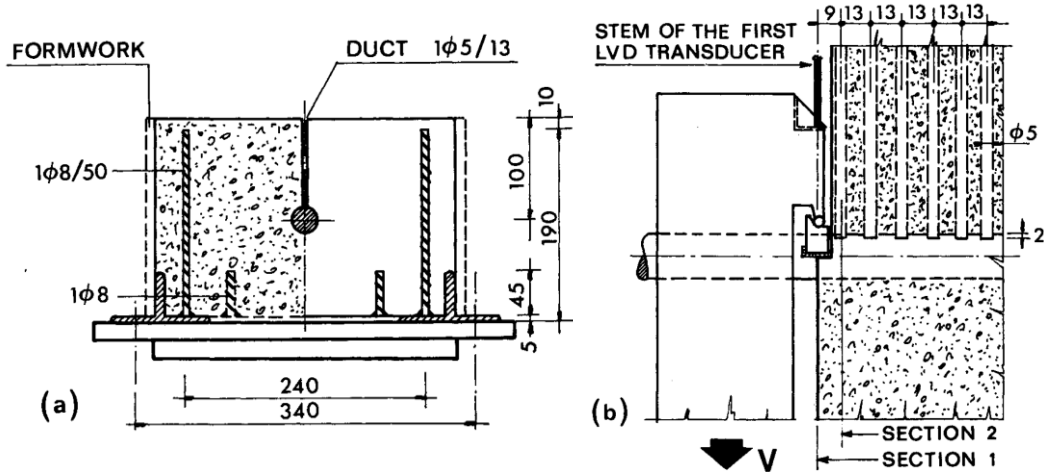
Test specimen with concrete-embedded ducts [Dei1992]
